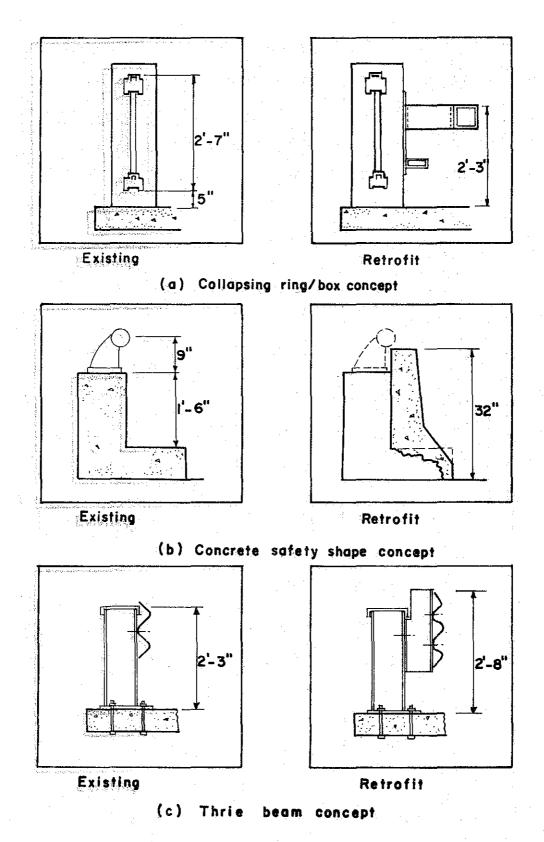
Possible Retrofit Concepts for Bridge Rails (88)
